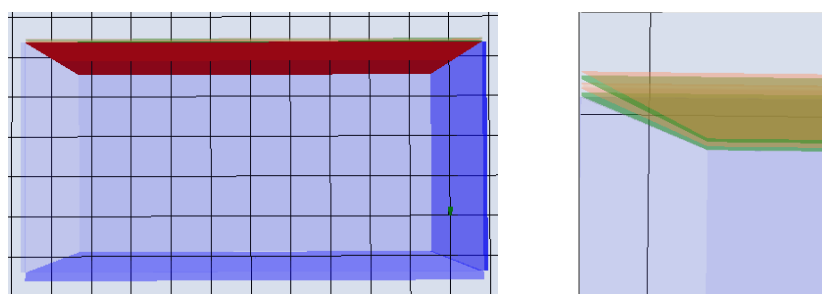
(left) 3-D model of building with a concrete slab (blue), tilt-up concrete walls (blue), steel roof decking (red), plywood decking (green), extruded polystyrene insulation (pink), and waterproof membrane (orange). (right) Zoomed in perspective to show roof layers.
